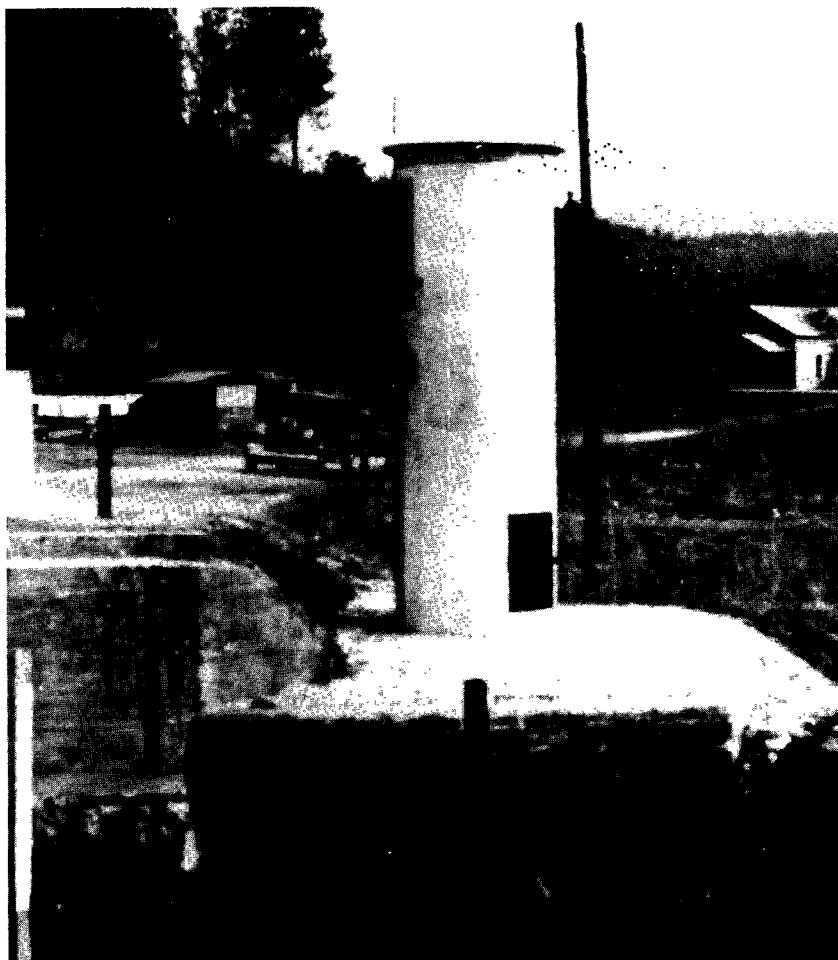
Concrete-pipe well and shelter. (Note clean-out door, staff gage, and upper intake pipe.)
